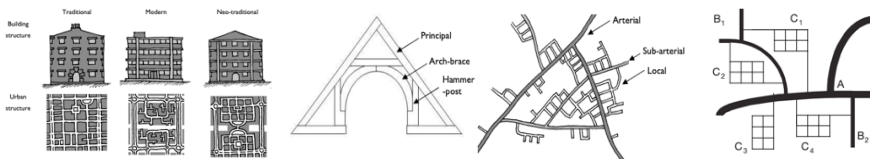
Three types and the arterial concept between building structure and urban structure (Marshall, 2006; 2005)
